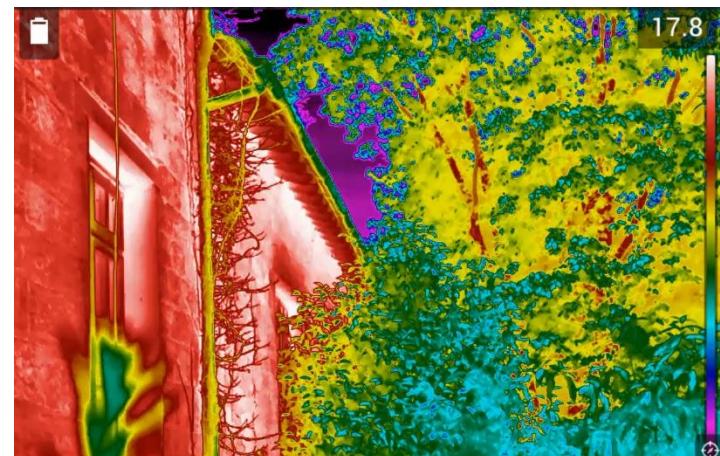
Clocktower Café, eastern elevation. View looking south-west using an infra-red camera.
